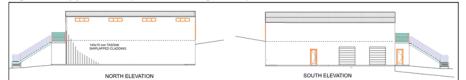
North and South Elevations (Adorn Drafting, 2023)
